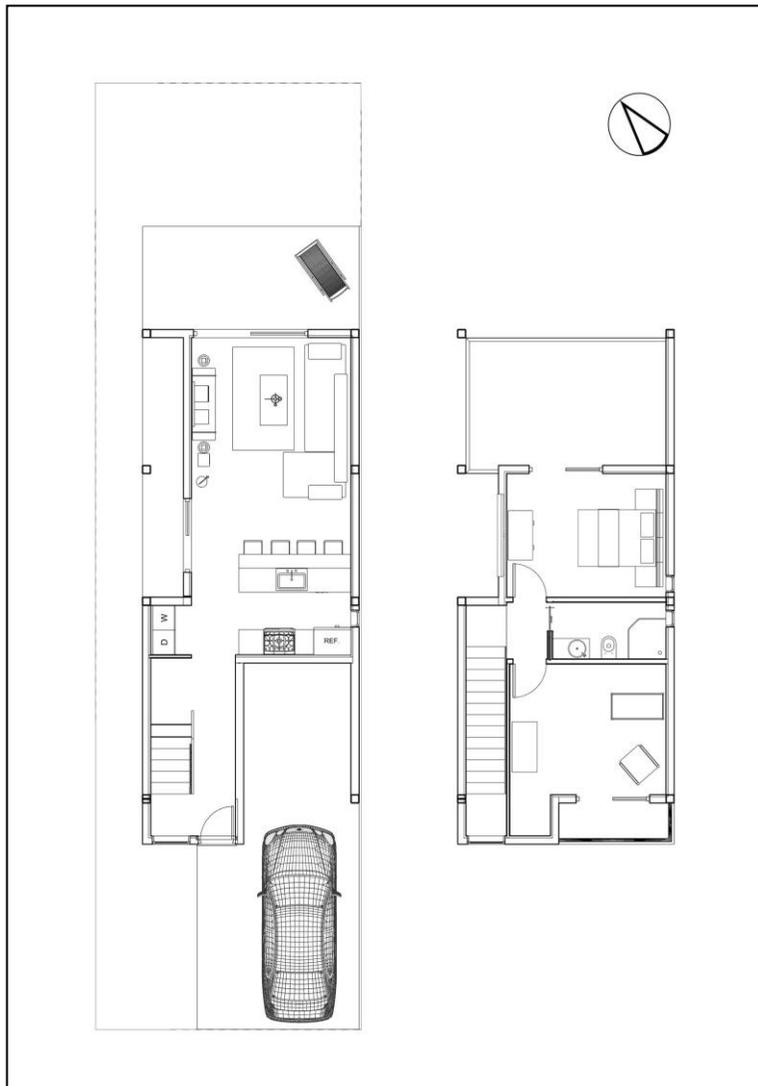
Ground floor furnished plan (left), first floor furnished plan (right)
